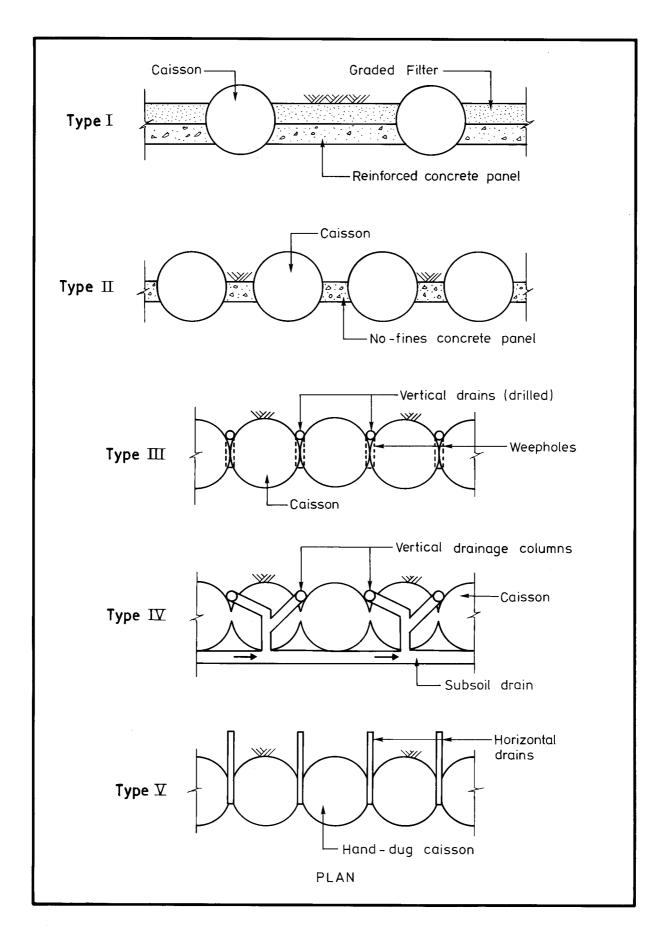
Types of Caisson Wall Drainage System (Malone, 1982)
